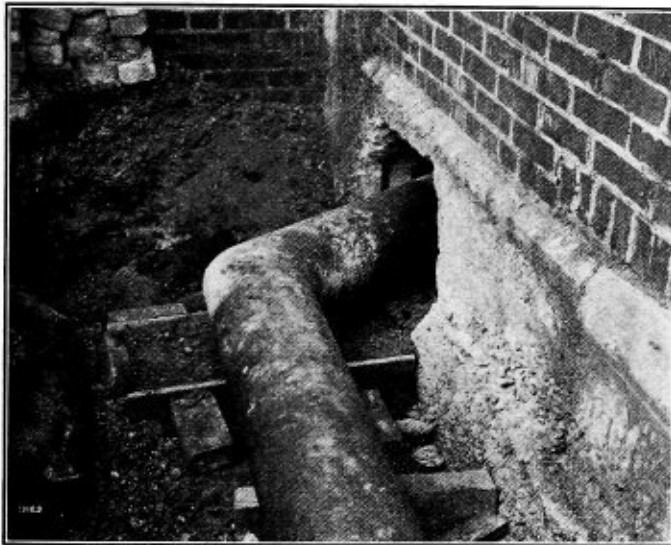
Welded Bend in 10-Inch Pipe
